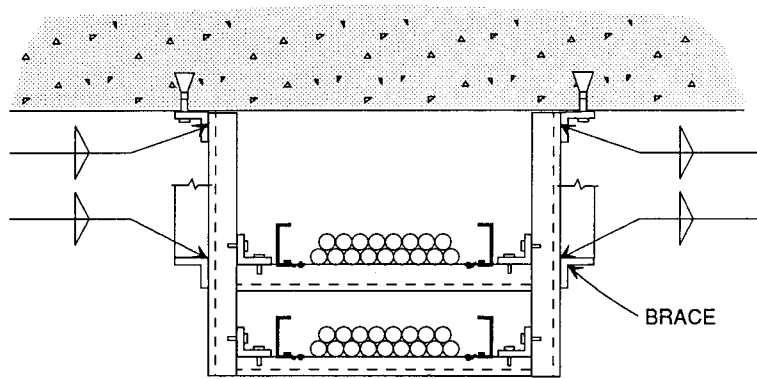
Cast-iron anchorage detail that failed at the Pacific Bell Alhambra Station, 1987 Whittier Earthquake.
